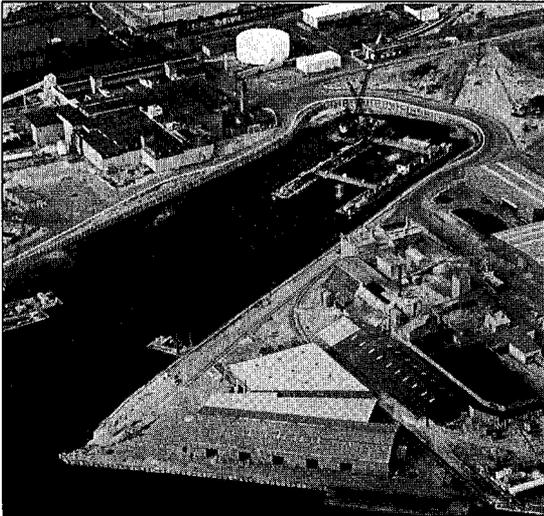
The east approach trench for the Fort McHenry Tunnel.
